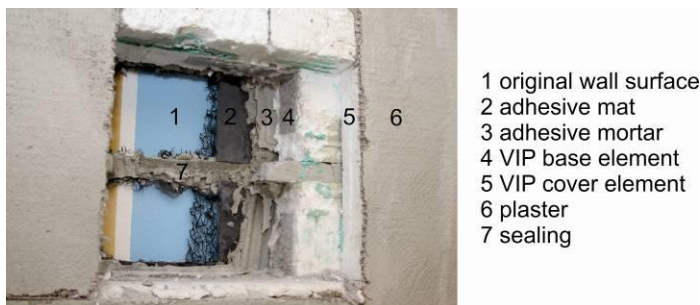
Component opening with layer indication of the interior insulation at the east wall.
